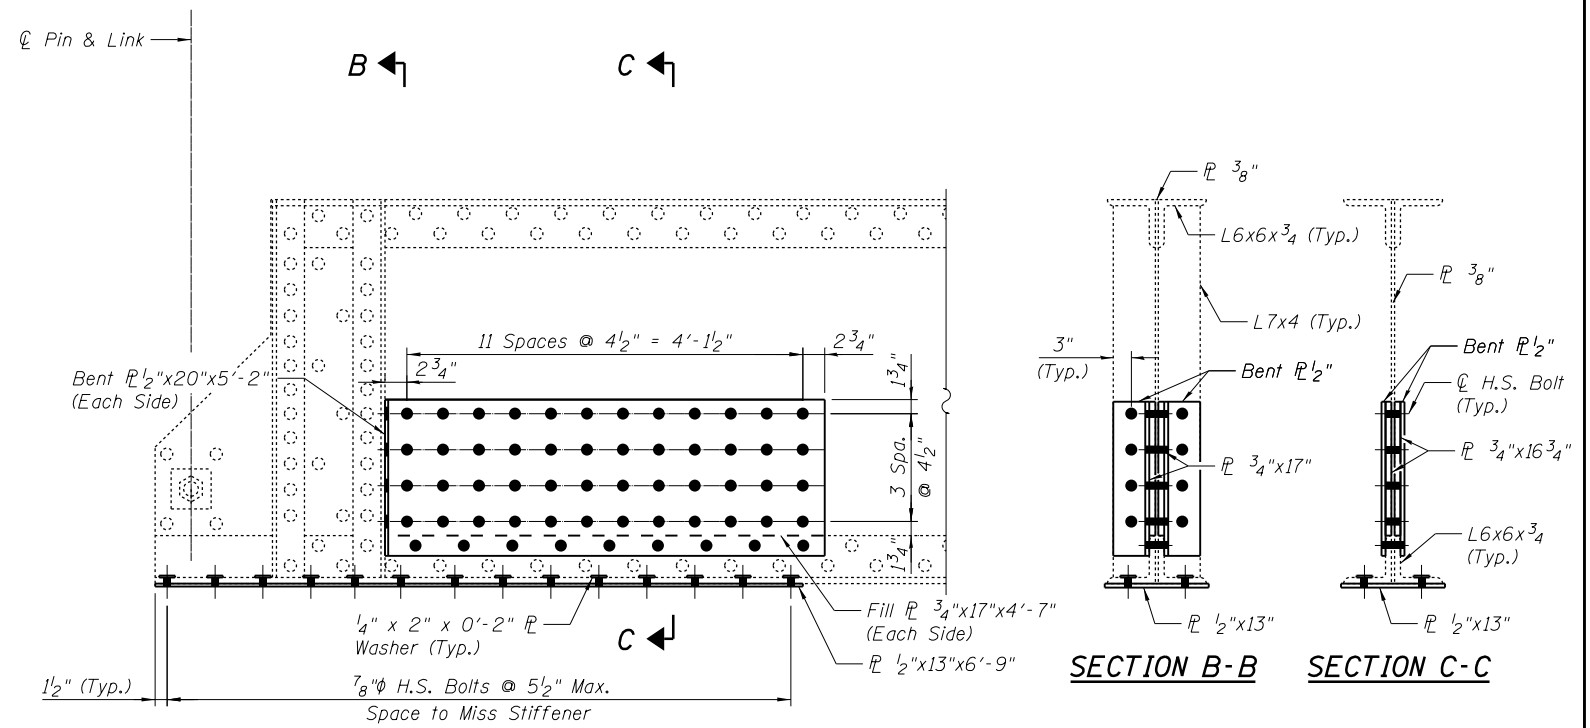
LOCATION AND PLATE SIZE SUMMARY
